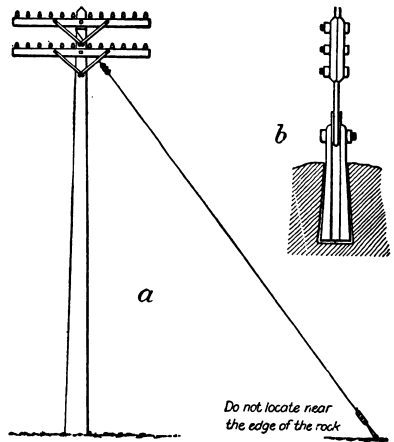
AERIAL LINE CONSTRUCTION; METHOD OF GUYING TO ROCK.
